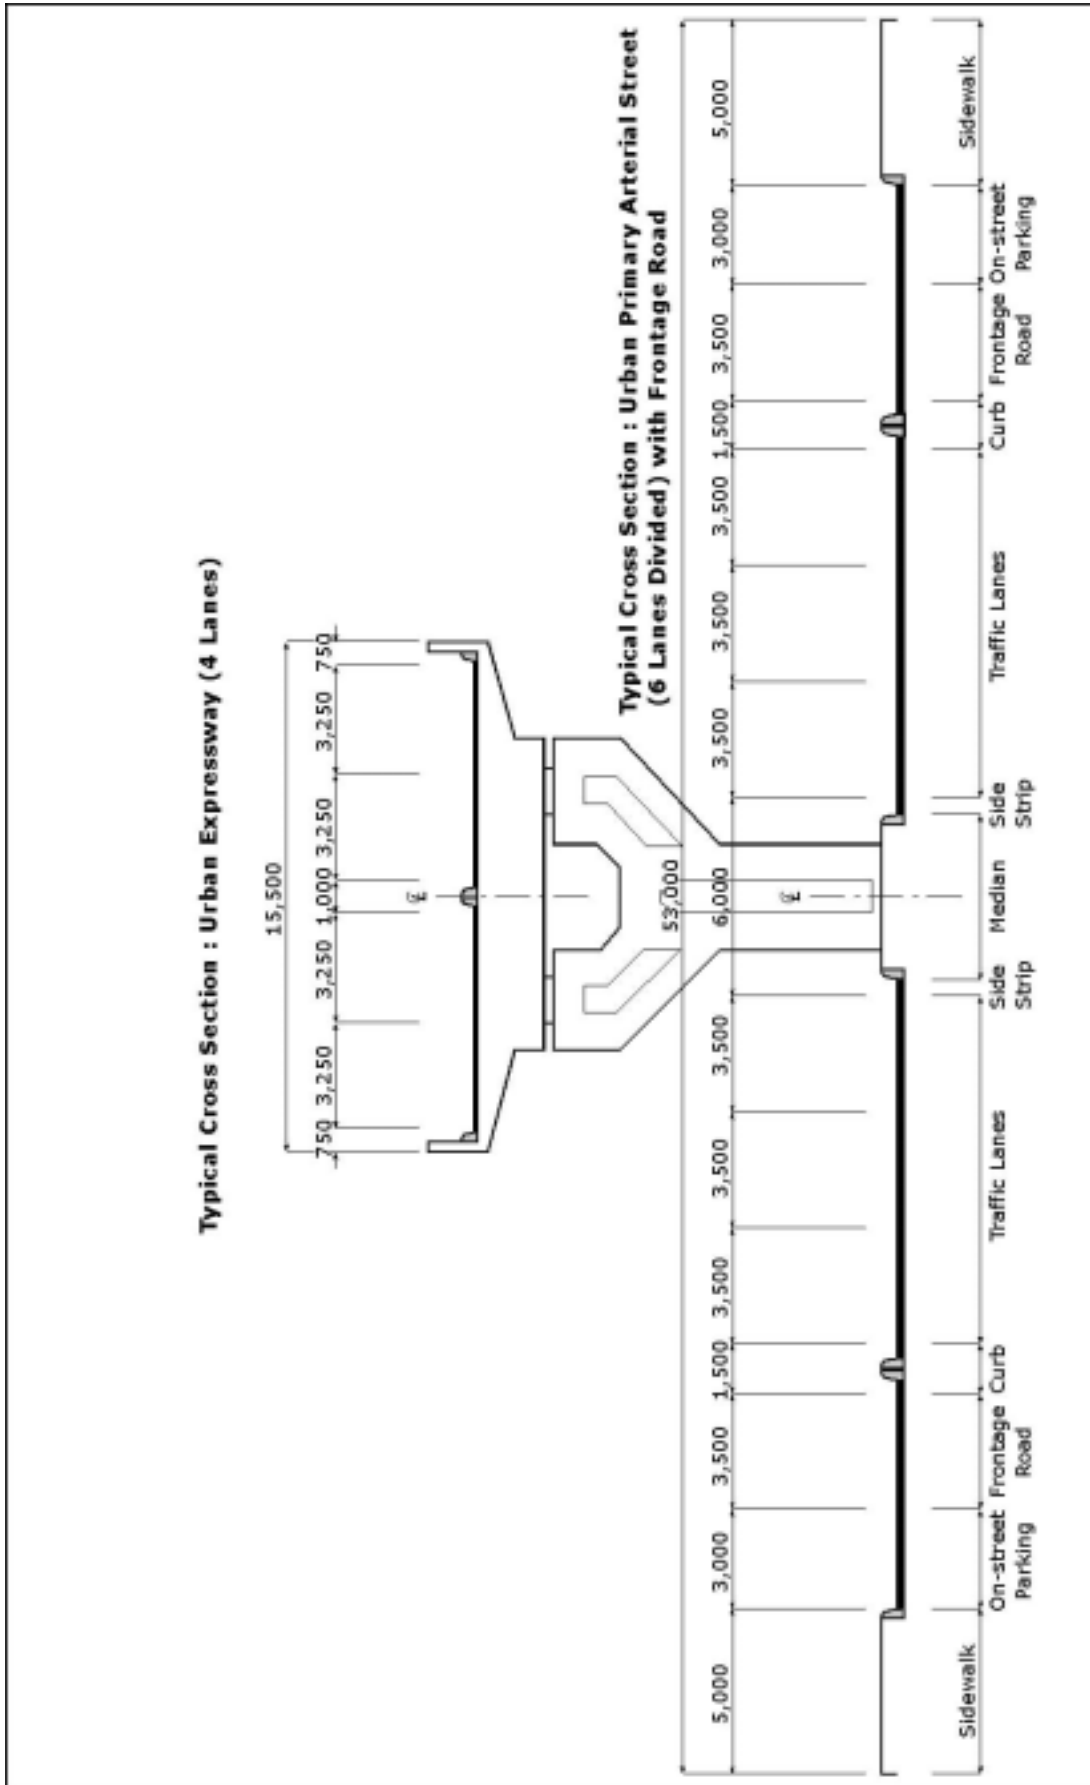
Typical Cross Sections for Urban Primary Arterial Street
